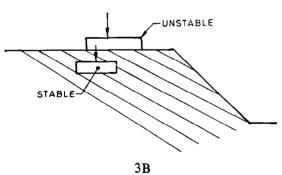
FOUNDATION ADJACENT TO SLOPING GROUND
